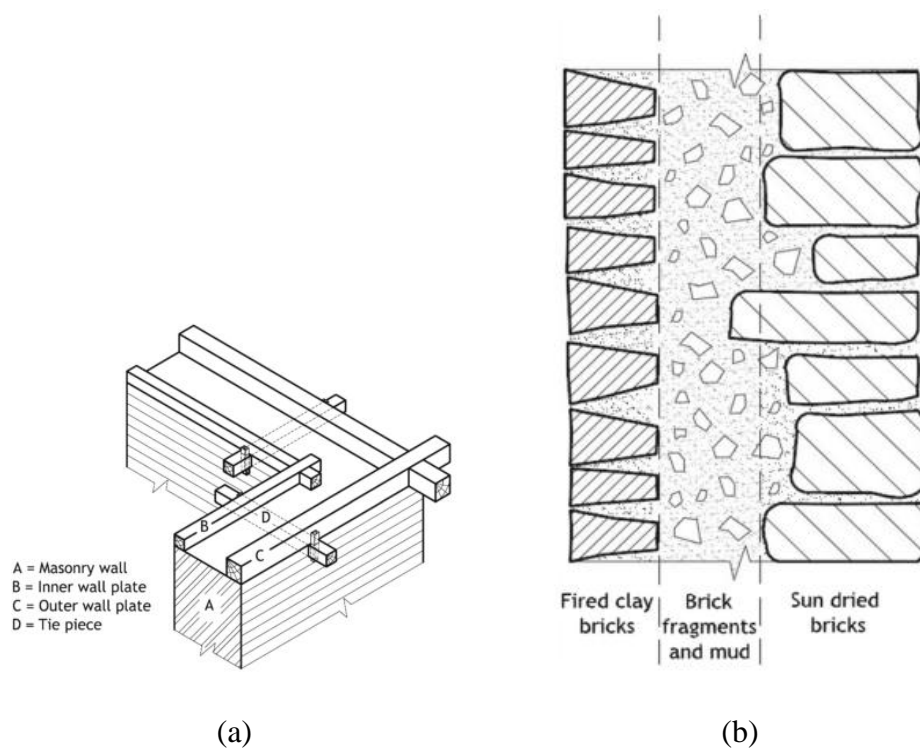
Wall cross-sections: (a) wall connection and (b) wall layers (Shakya et al. 2014).
